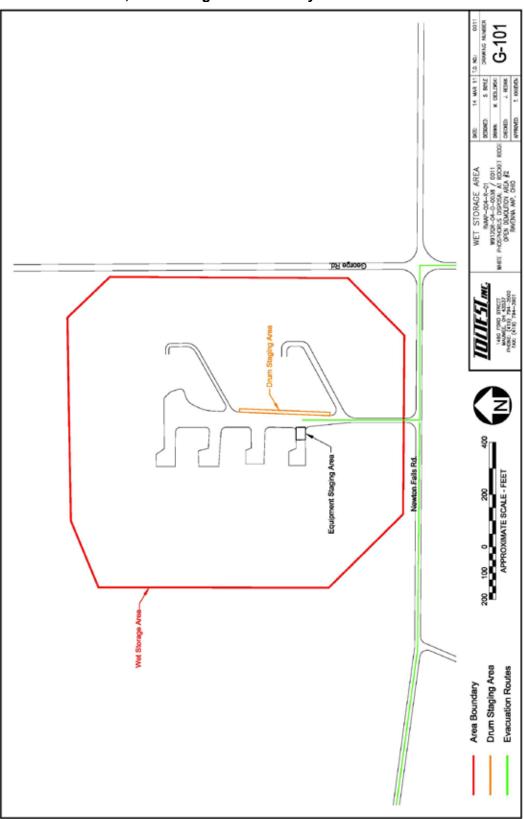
, Wet Storage Area Site Layout/Evacuation Plan
